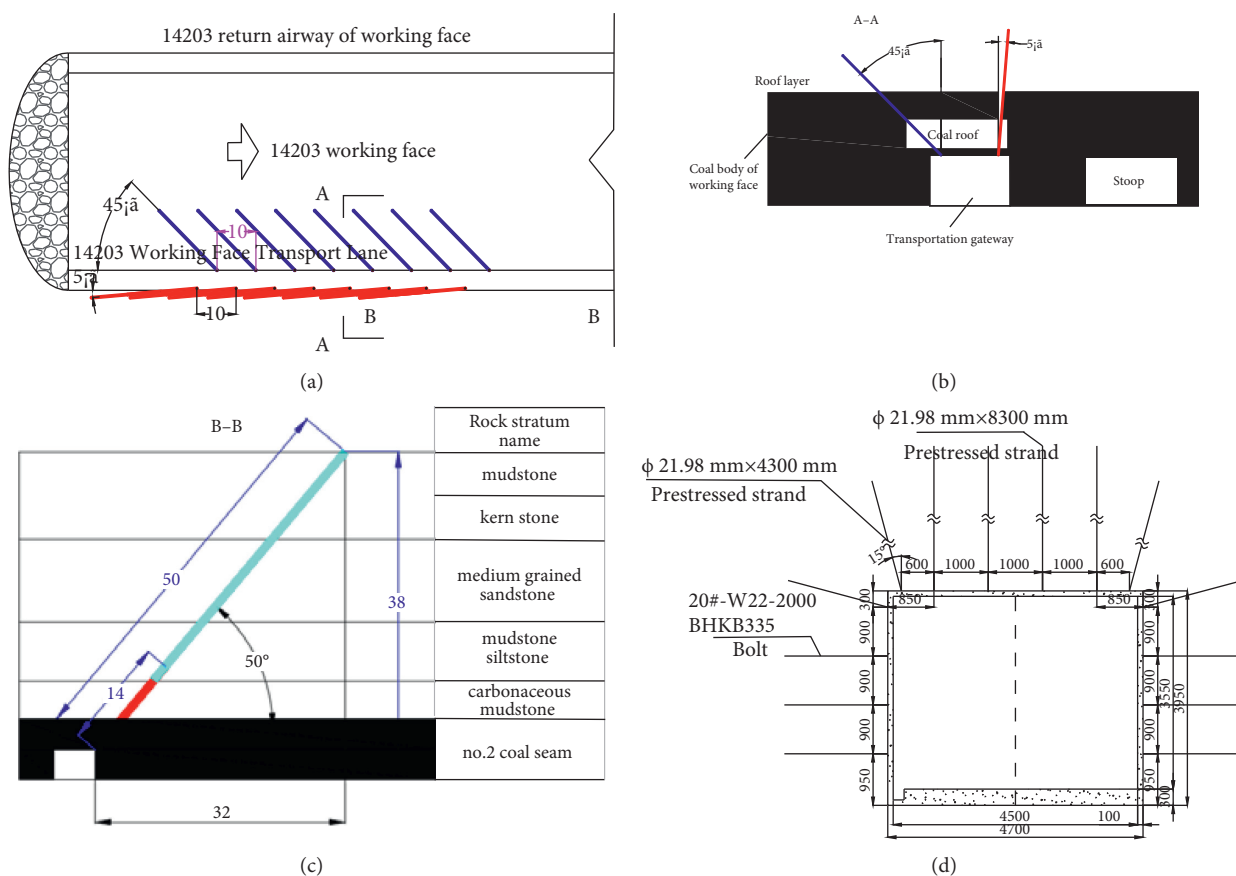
Hydraulic fracturing and supporting parameters of rubber haulage gateway 14203. (a) Drilling layout plan. (b) Section A-A. (c) Section B-B. (d) Sectional view of rubber-tire haulage gateway support.
